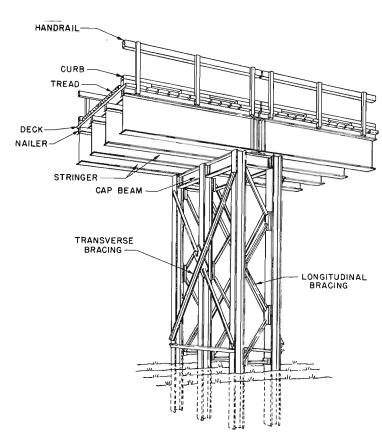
Highway bridge, class 50, single-lane, steel stringers on steel pile pier.
